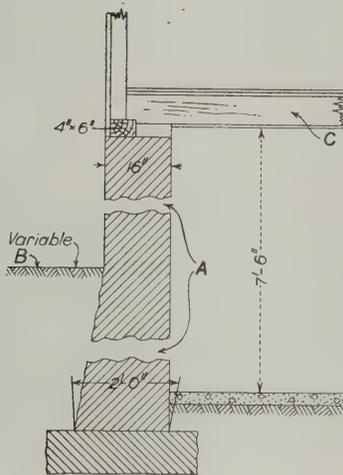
Section of Foundation Wall—Scale 1/4 In. to the Foot
